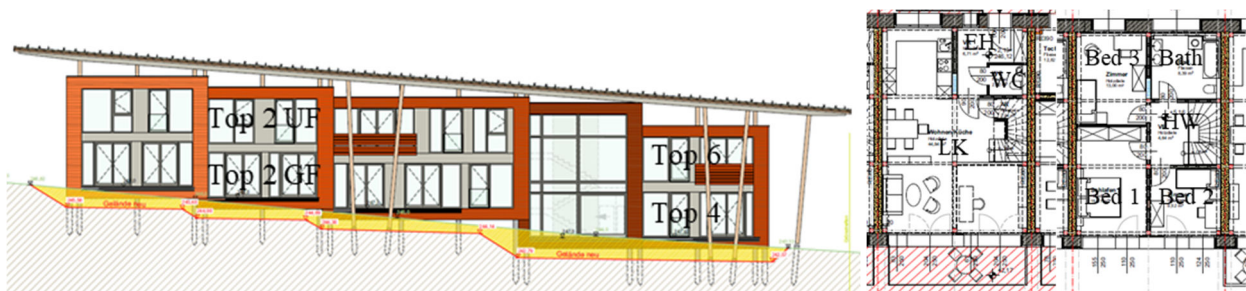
South view of the building compound (left), floor plan Top 2 GF and Top 2 UF (right).
